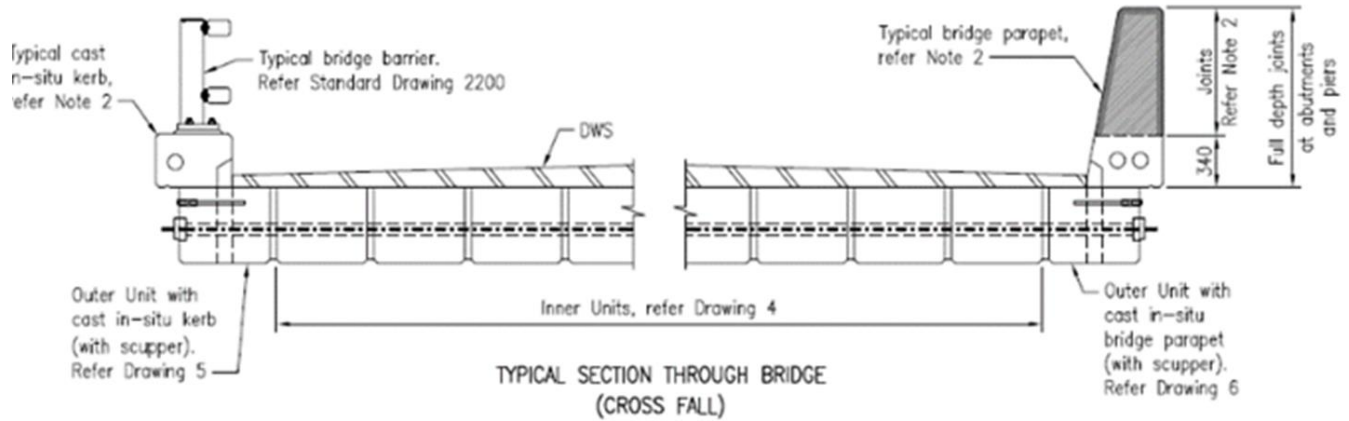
Typical bridge deck in Australia (TMR, 2021)
